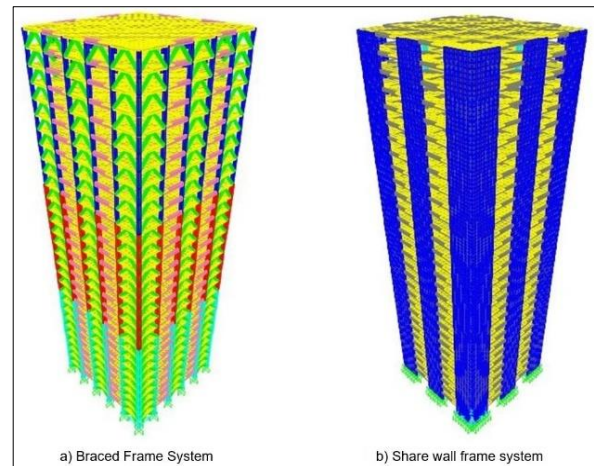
3D view of shear wall system and braced system model for 30-storey building model
